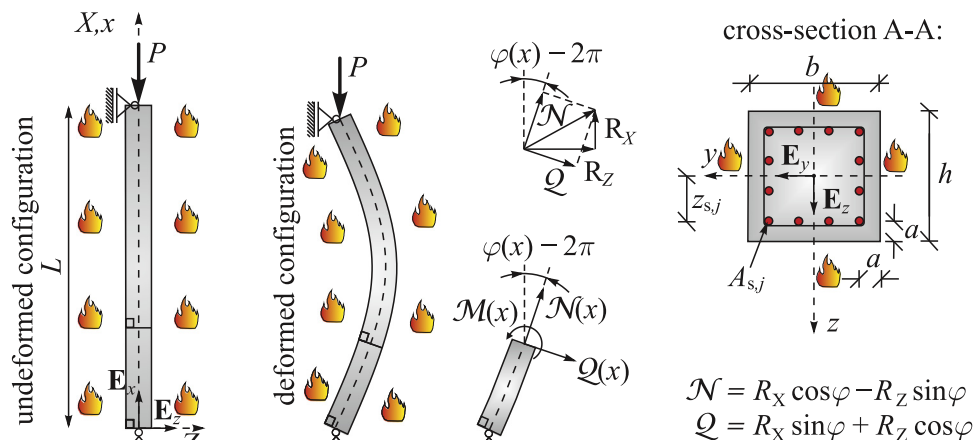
Geometry and notation for an ideal reinforced concrete column, its undeformed and deformed configuration and a typical cross-section.
